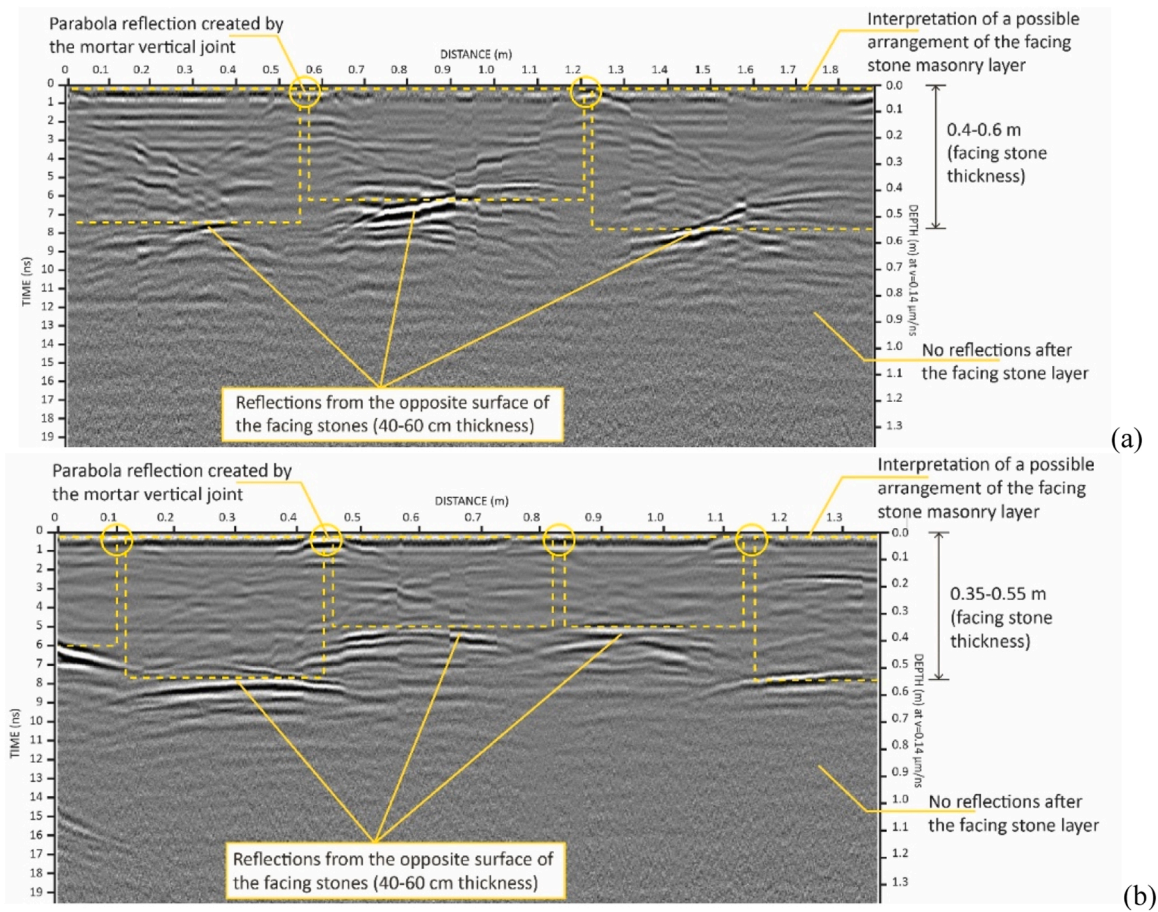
GPR (a) horizontal and (b) vertical scan at the wall of the bridge abutment.
